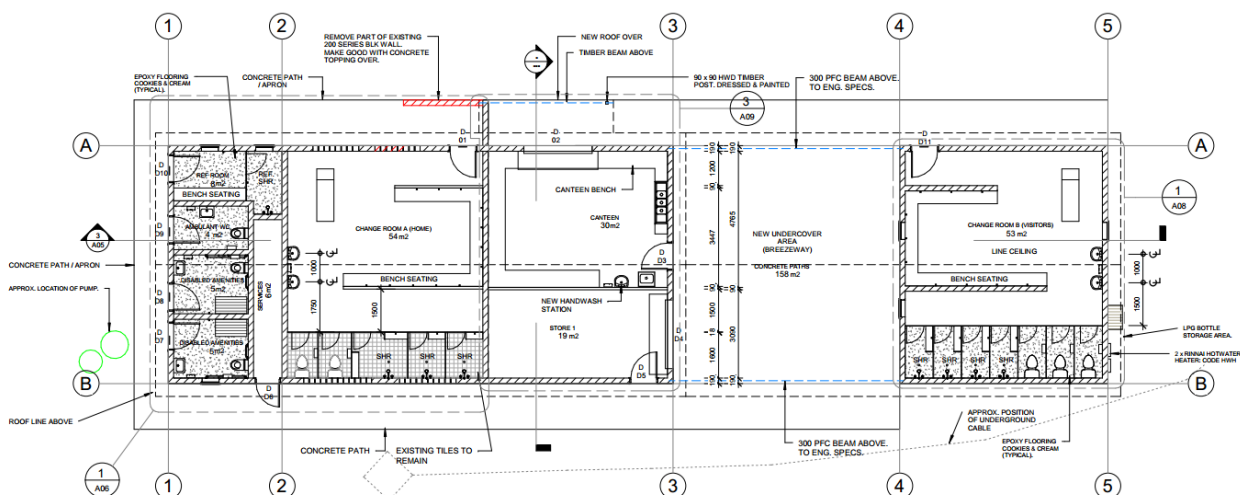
Floor Plan – Original Design: New change room, public toilets and the refurbished existing amenities & canteen
